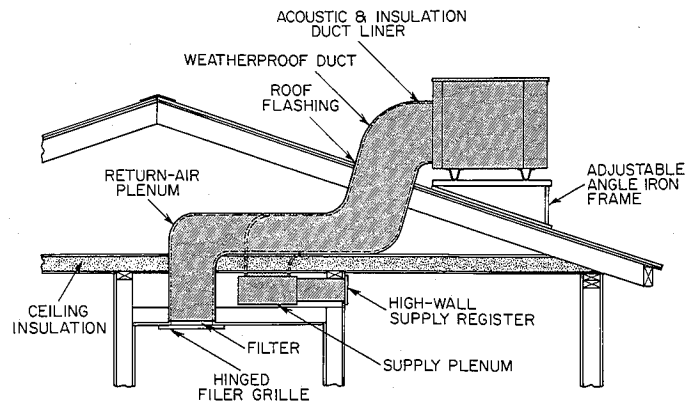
542E Typical Rooftop Installation on Pitched Roof
